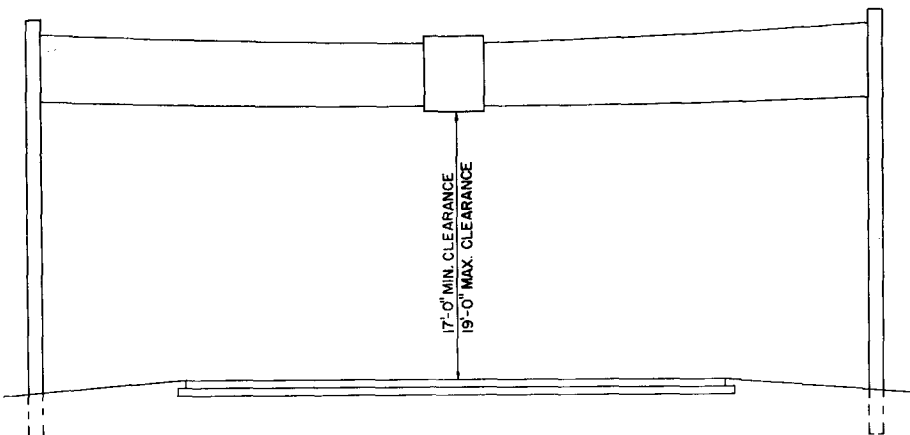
DETAIL / SINGLE PANEL ON DROP PIPE AND SPAN WIRE
